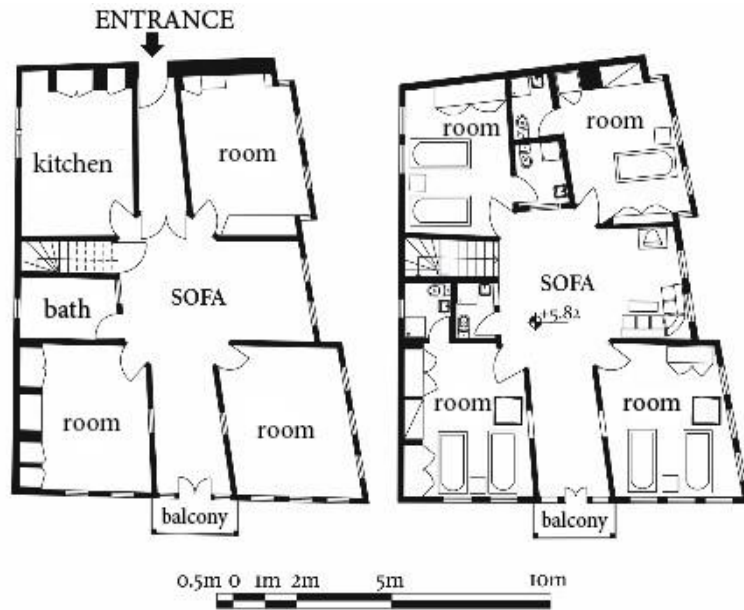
First and second floor plans / Çakırlar House ((measured restoration)
